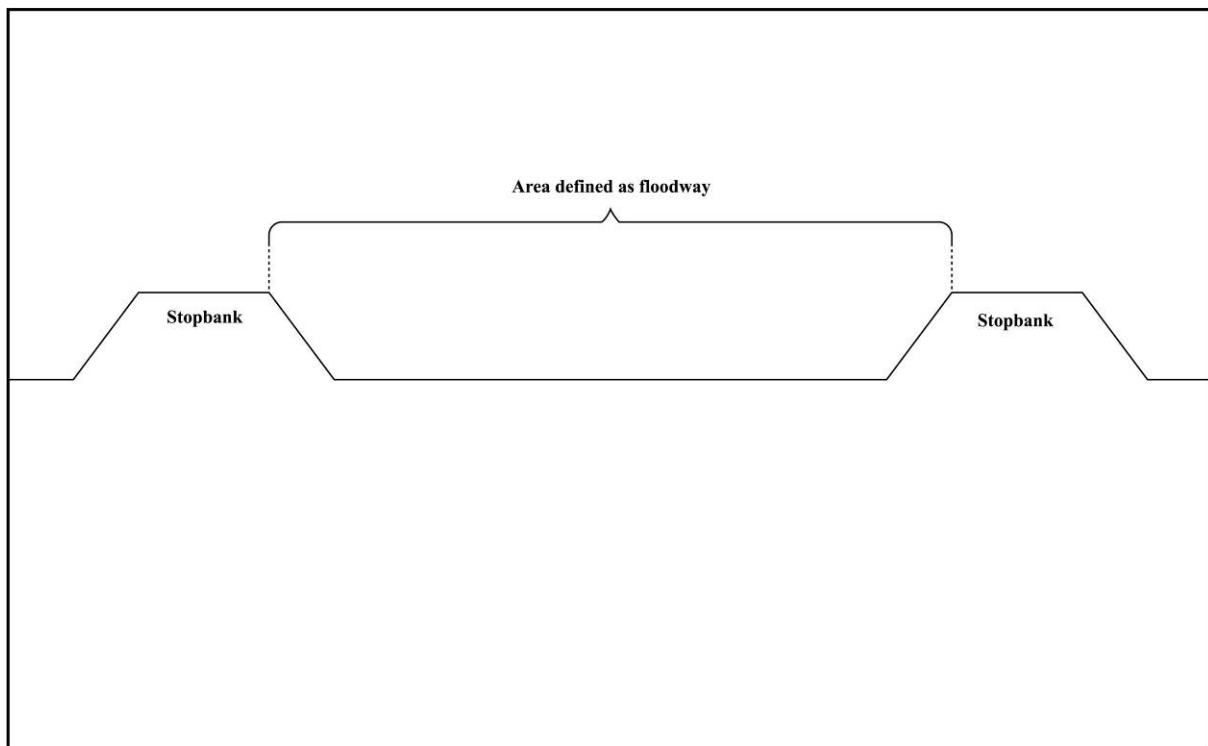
1 Typical Cross Section of the Rangitaiki Floodway
